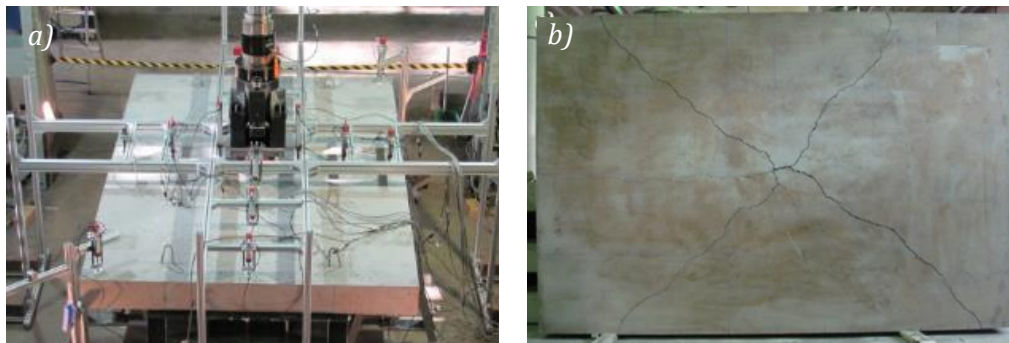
a) Central loading configuration and b) crack pattern of the slab.
